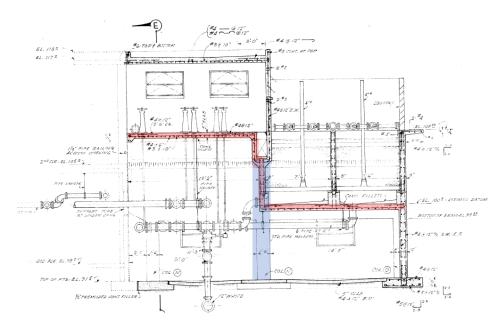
Shear Wall not Continuous to Foundation (Blue Shaded) and with Split Level
